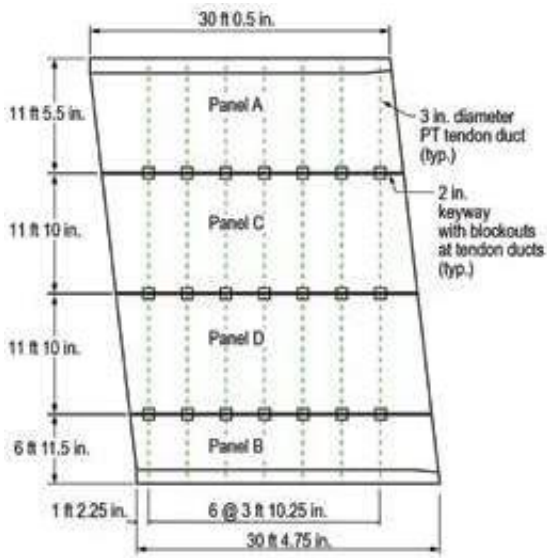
Panel layout and post-tensioning duct locations at the I-10 bridge approach slab (Note: 1 ft. = 0.3 m ; 1 in. = 25 mm)
